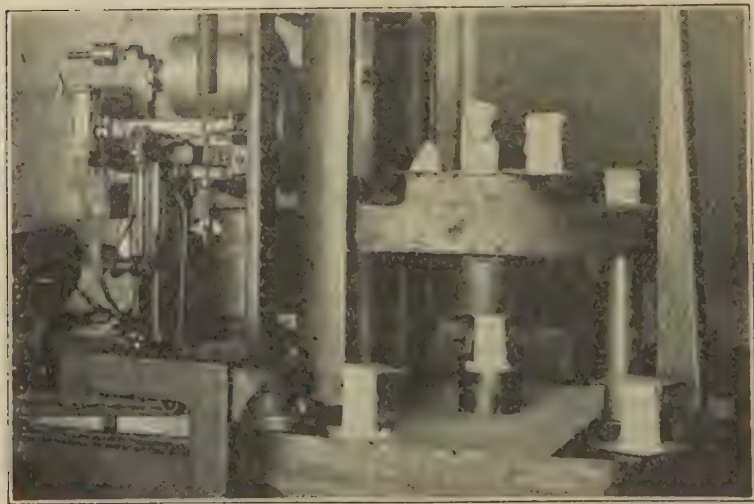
LABORATORY SPECIMENS AS TESTED: ROCK ISLAND ARSENAL.
